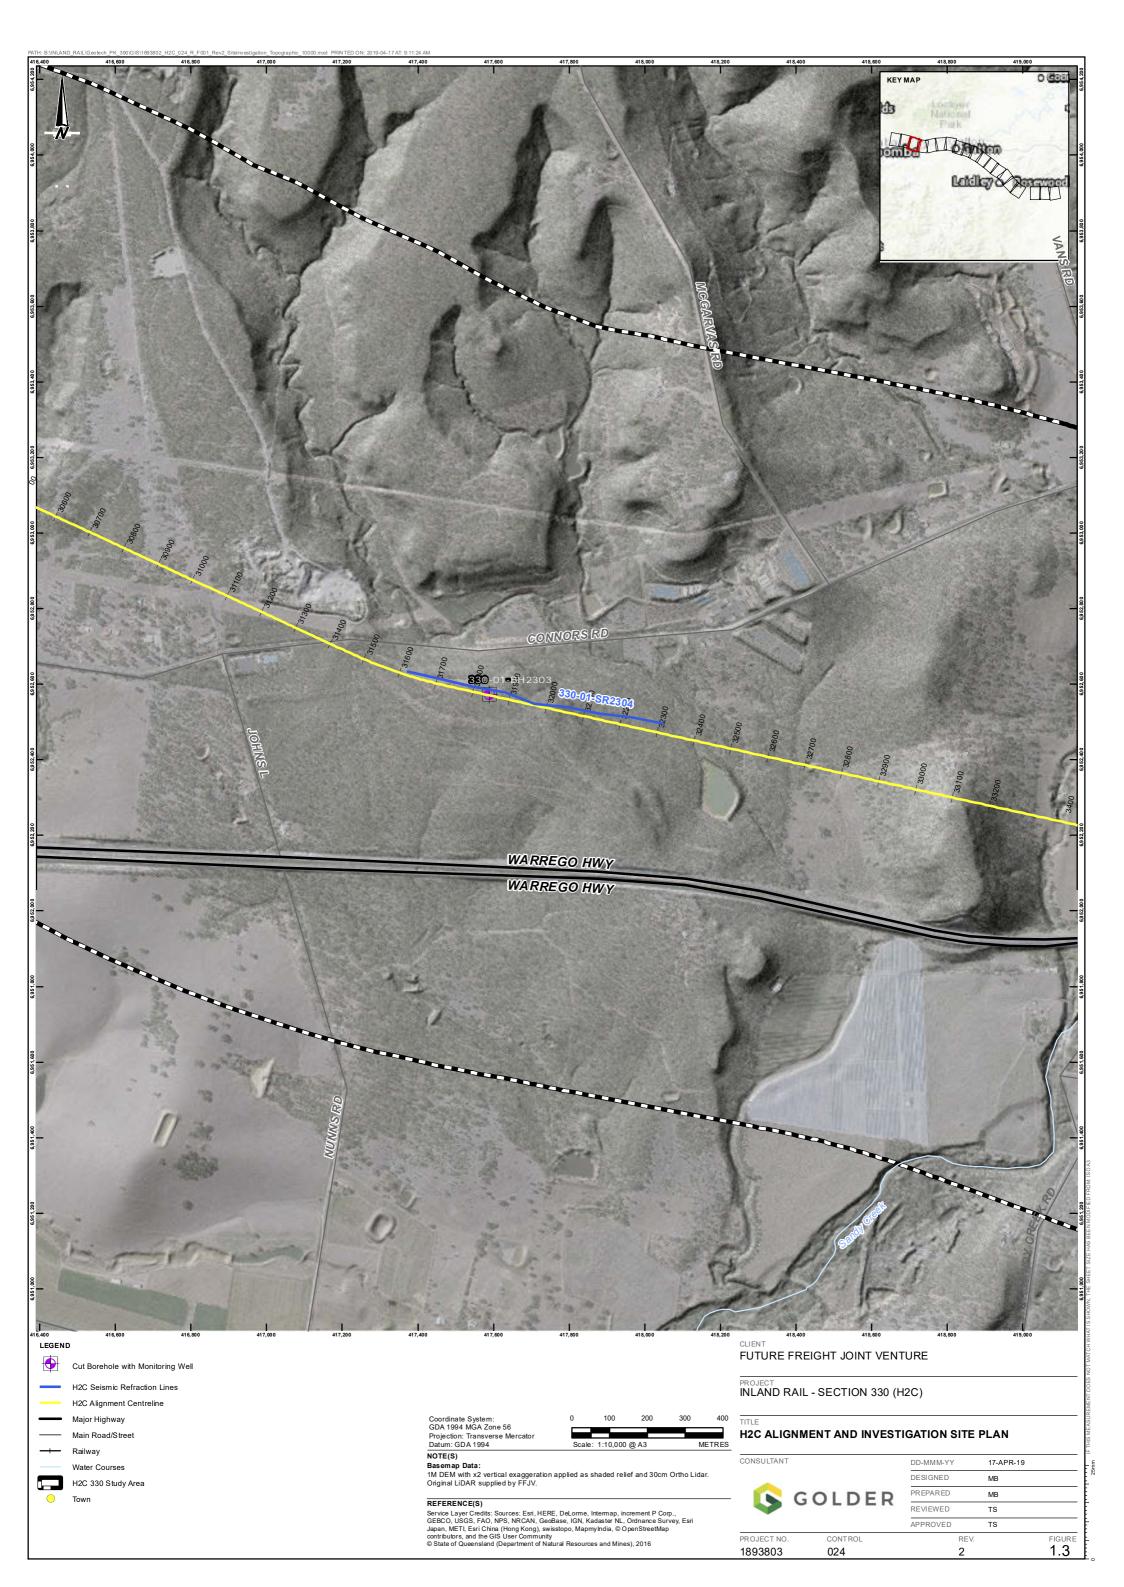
to 1.20: Helidon to Calvert Alignment and Investigation Site Plan
